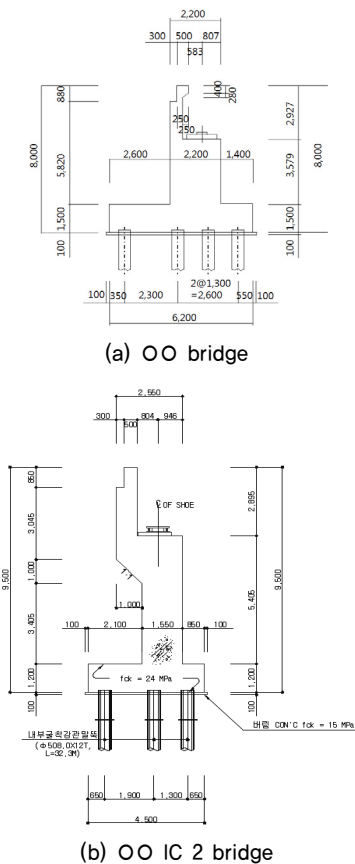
Schematic diagram of abutment OO bridge and OO IC 2 bridge
